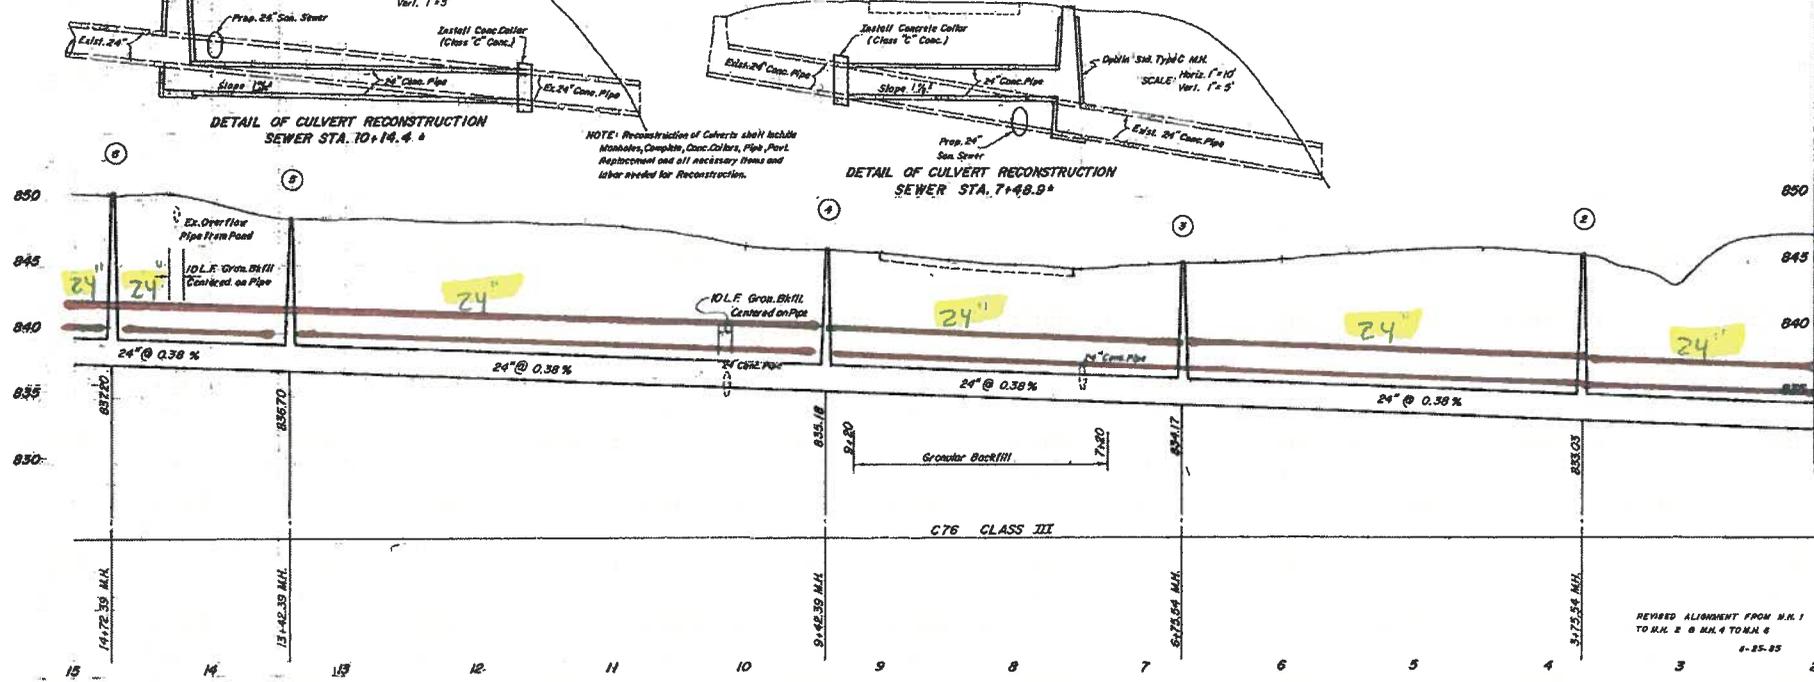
DETAIL OF CULVERT RECONSTRUCTION SEWER STA. 10+14.4
